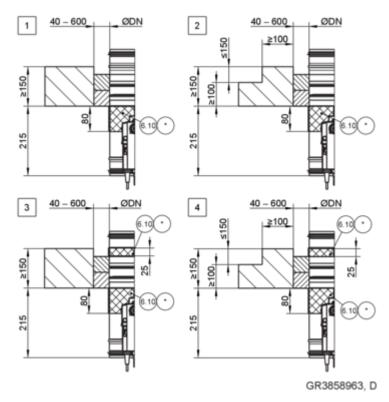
Dry mortarless installation into a solid ceiling slab, with a fire batt, suspended
